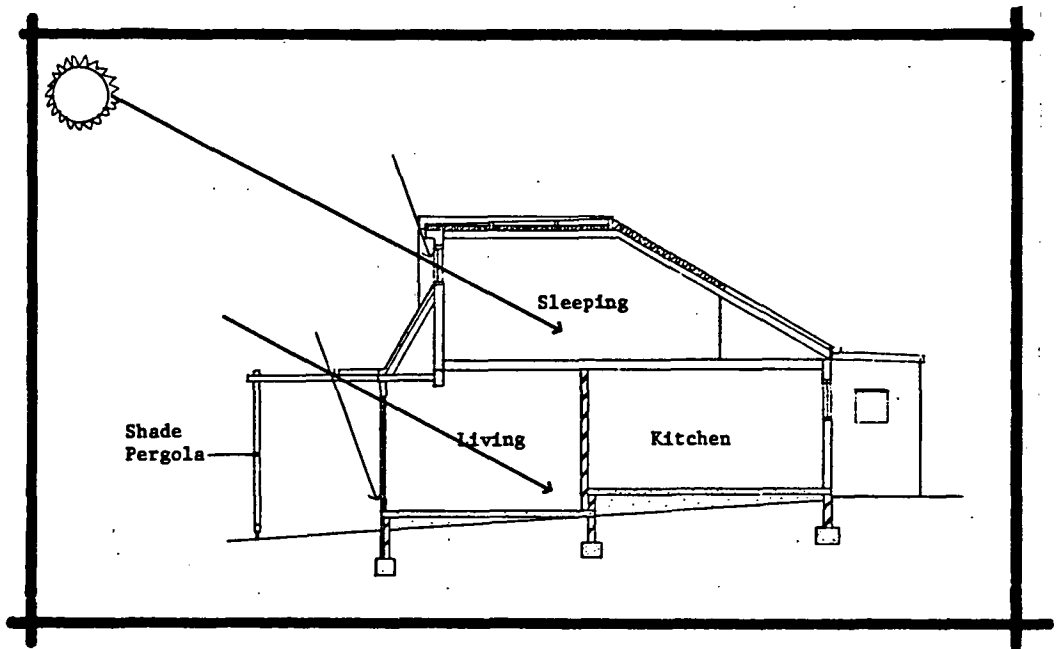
Section drawing, Button House, Mt. Nelson, Hobart, showing the method of passive heat collection.
